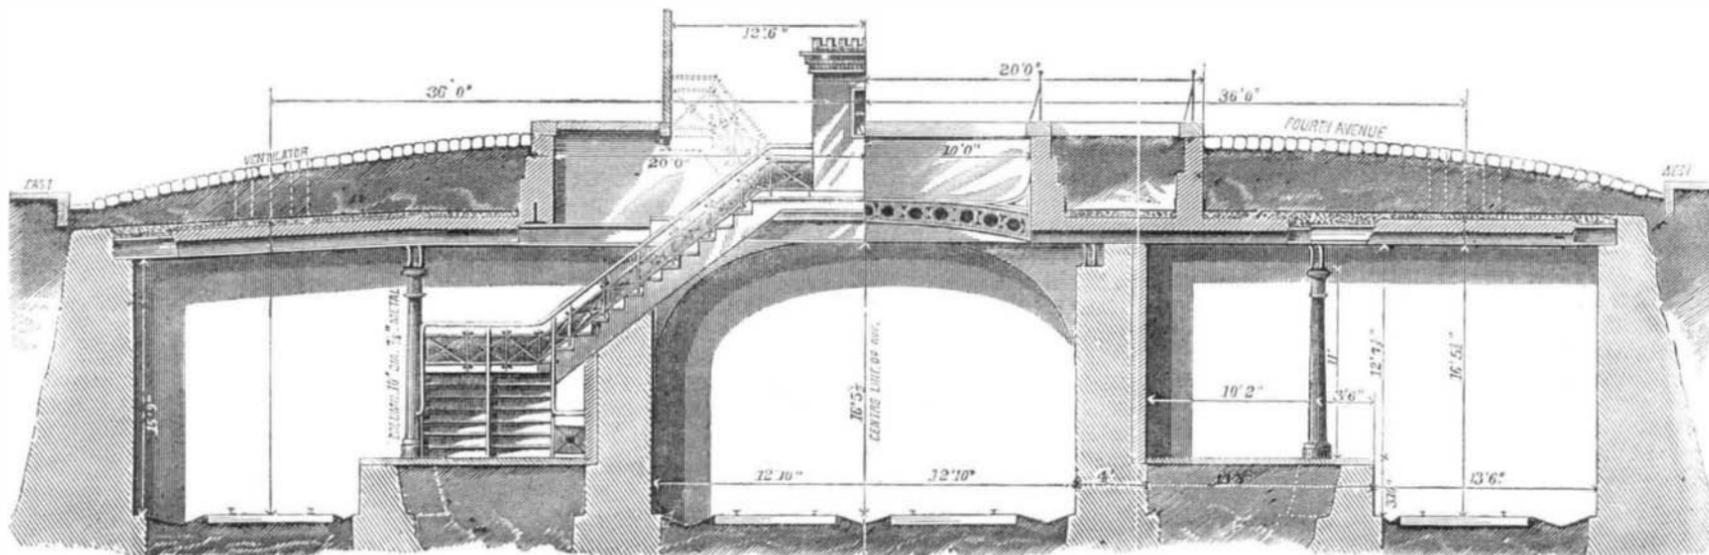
THE UNDERGROUND RAILWAY NEW YORK CITY.—THE 86th STREET PASSENGER STATION.
